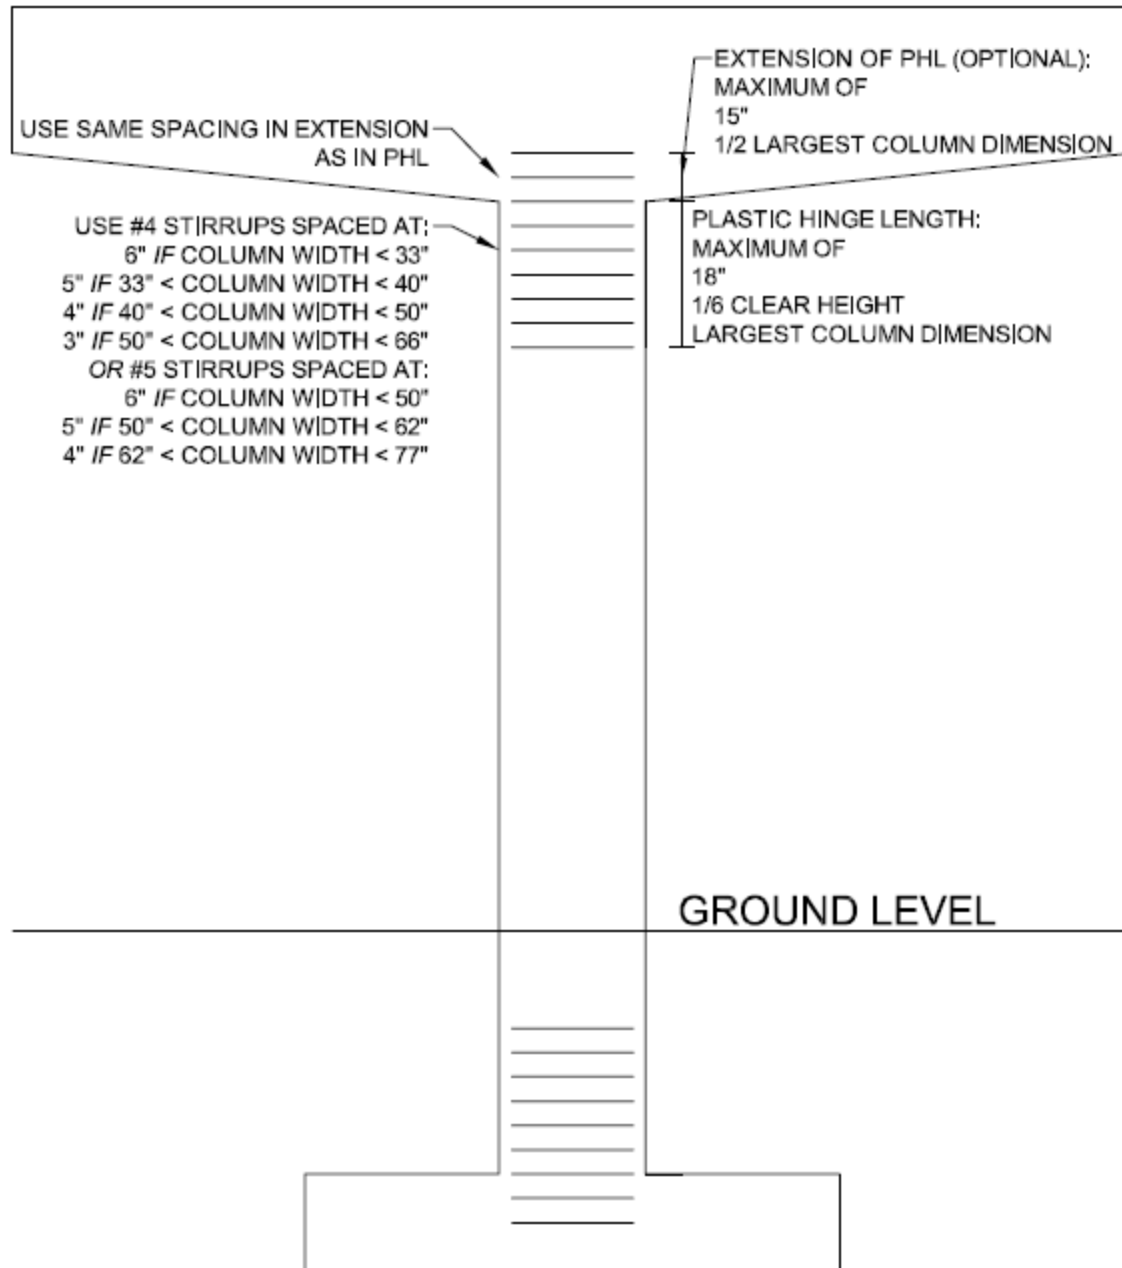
Standard Details for Rectangular Columns in SDC B
